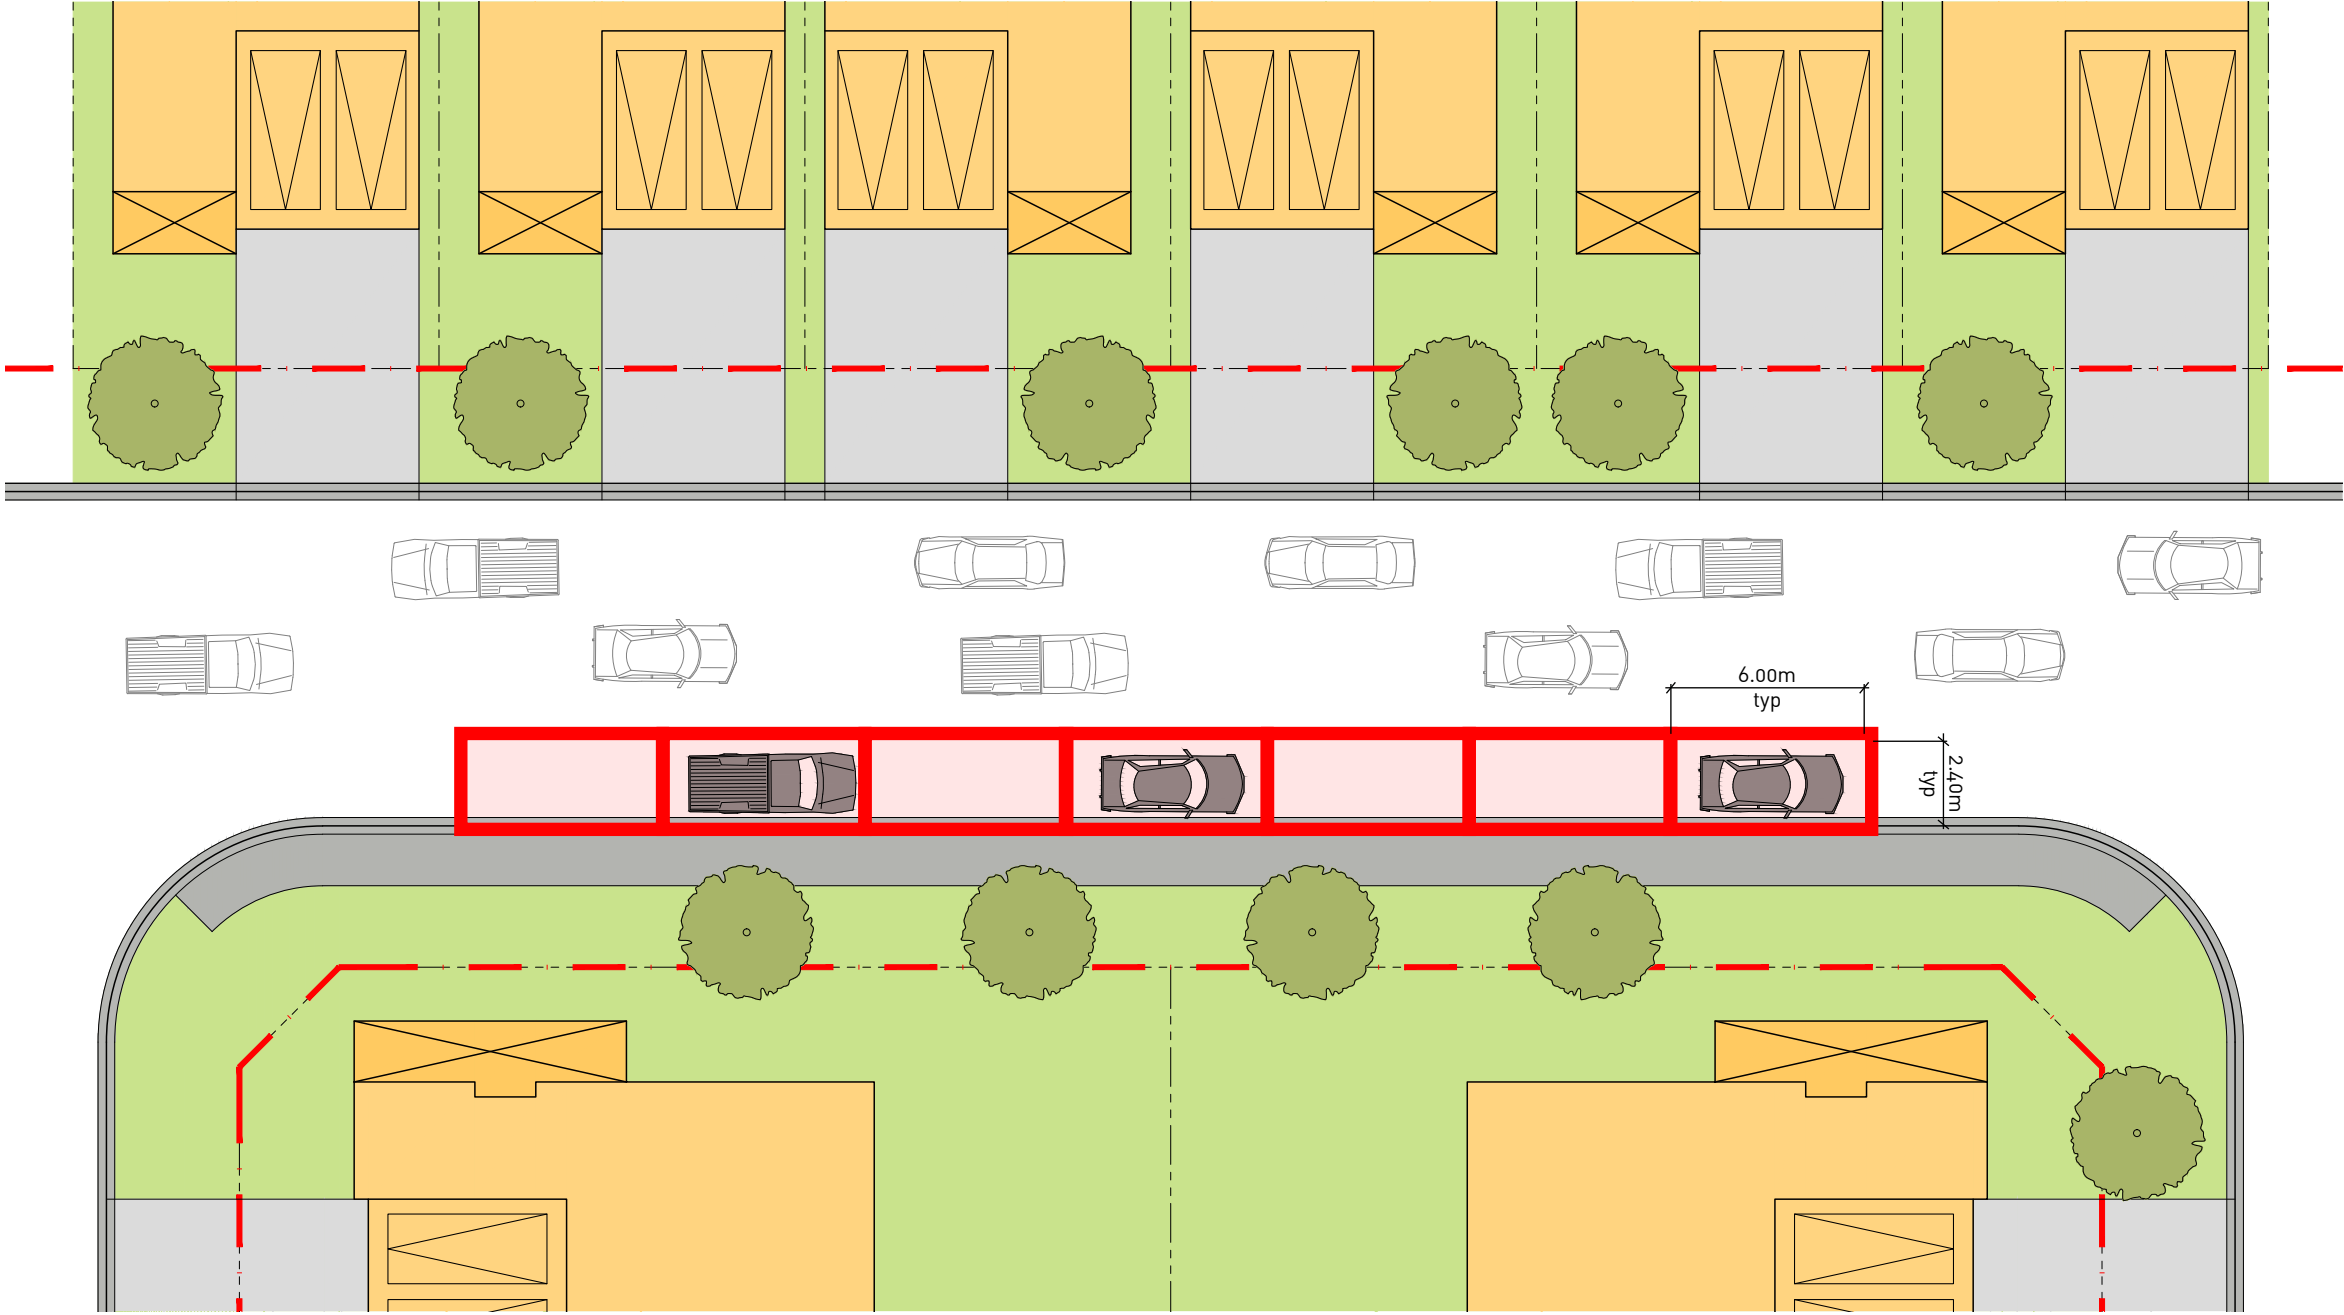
18.00m Local Road Single-Sided On-Street Parking Configuration
